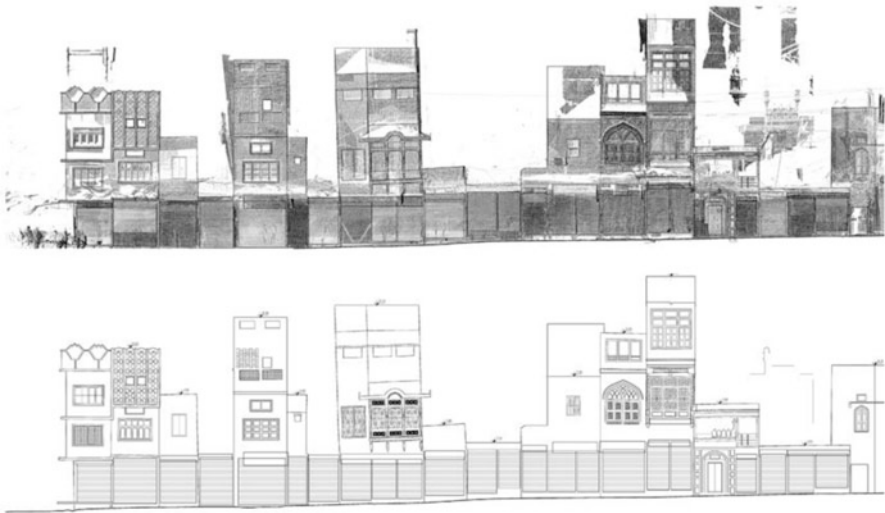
Layout of elevations along Haram Bazaar (urban design team)
